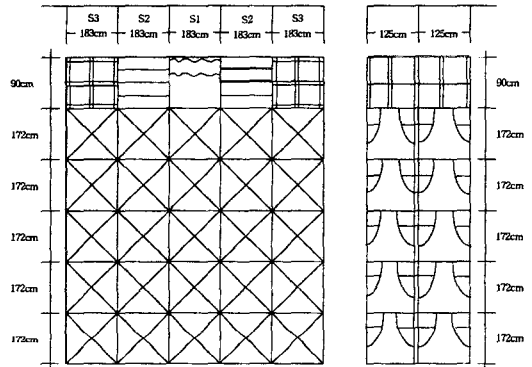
Elevation and side view of tubular scaffold for experimental use
